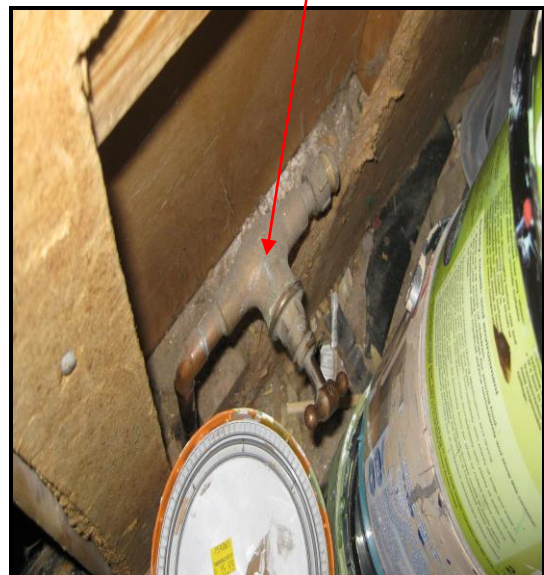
WH 2 Located in the Ground Floor Disabled WC
